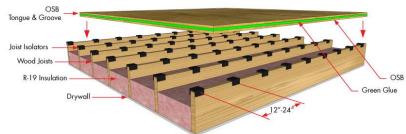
Install sound insulation between floor joints, then overlaid by new boards
